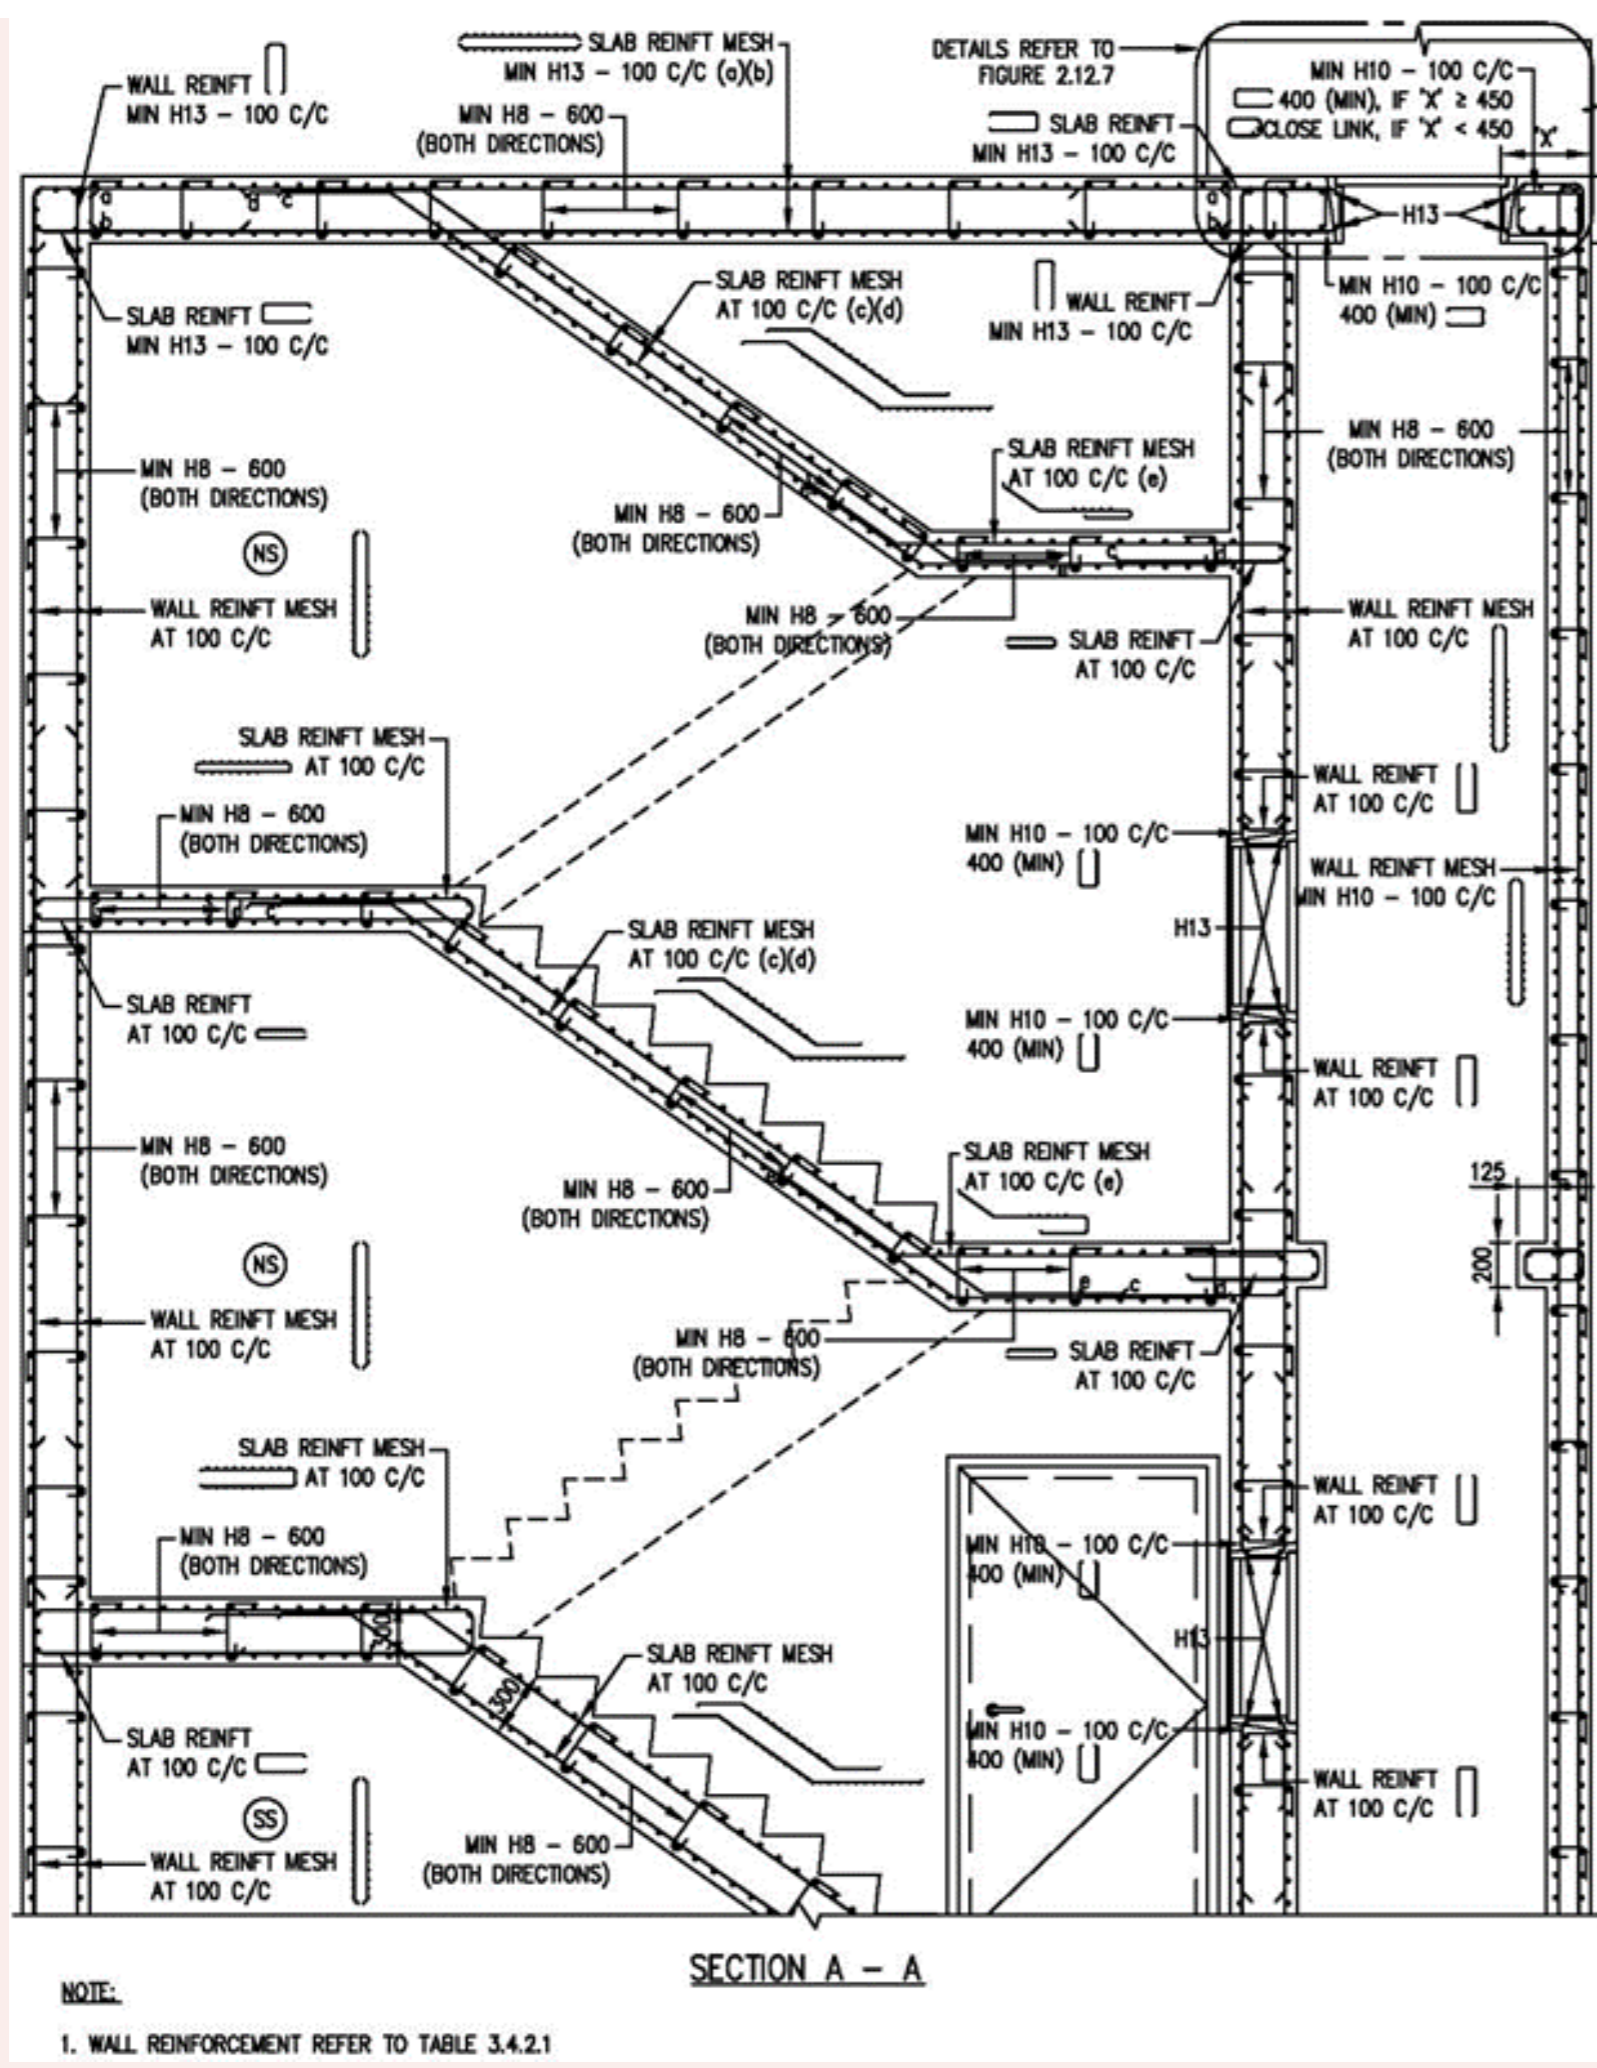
(l): SECTIONAL DETAILS OF SS SLABS/ WALLS FOR S/C SS
